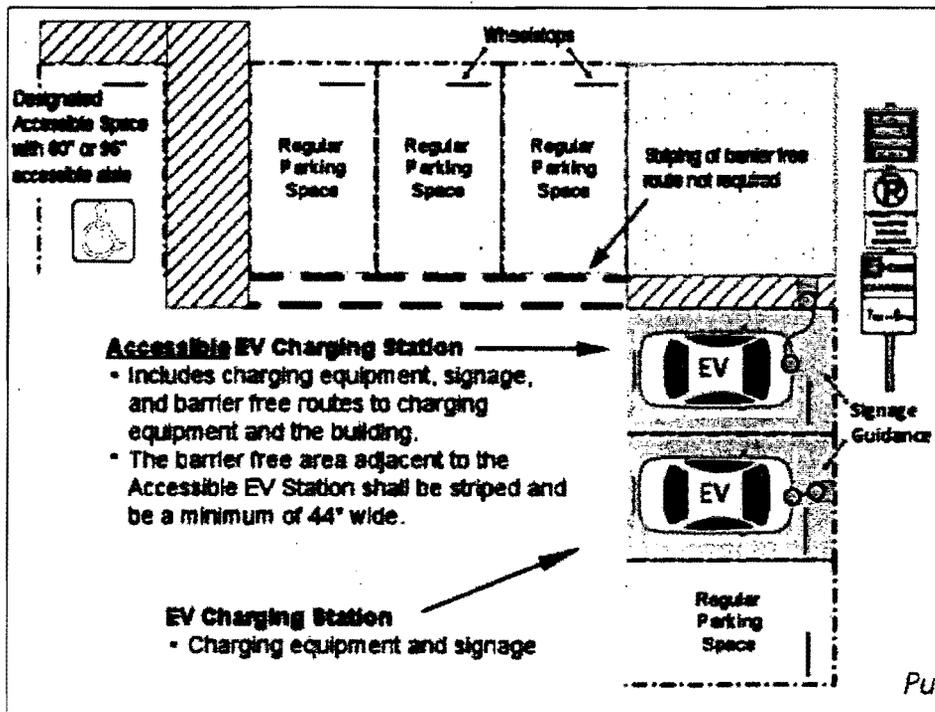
Off Street Accessible Electric Vehicle Charging Station Option 1
